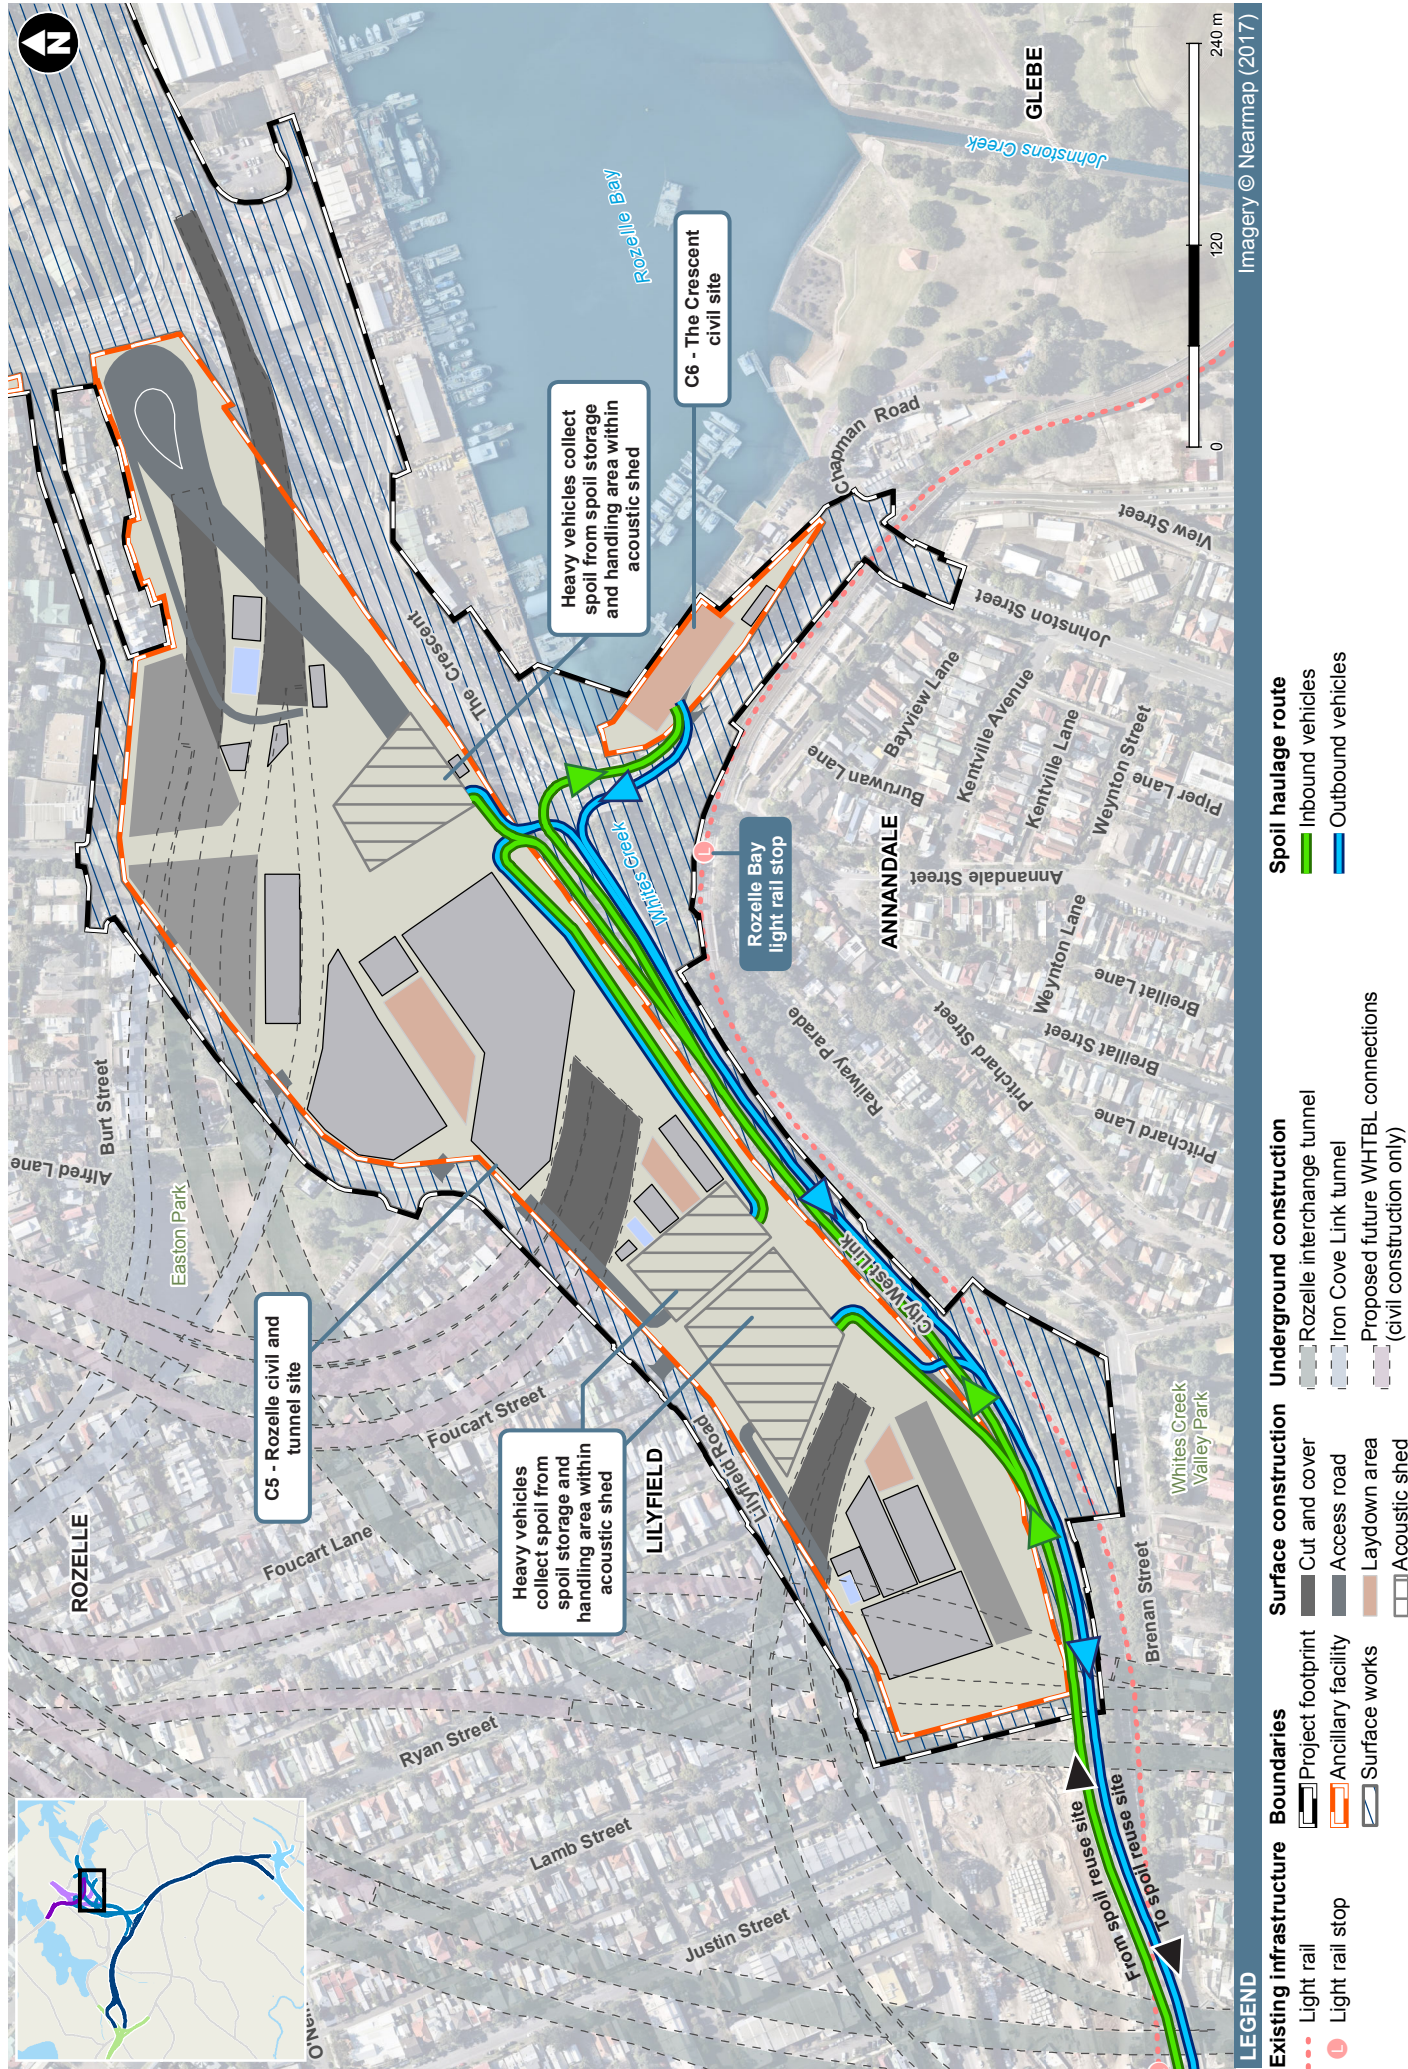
Indicative spoil haulage route – Rozelle civil and tunnel sites (C5)
